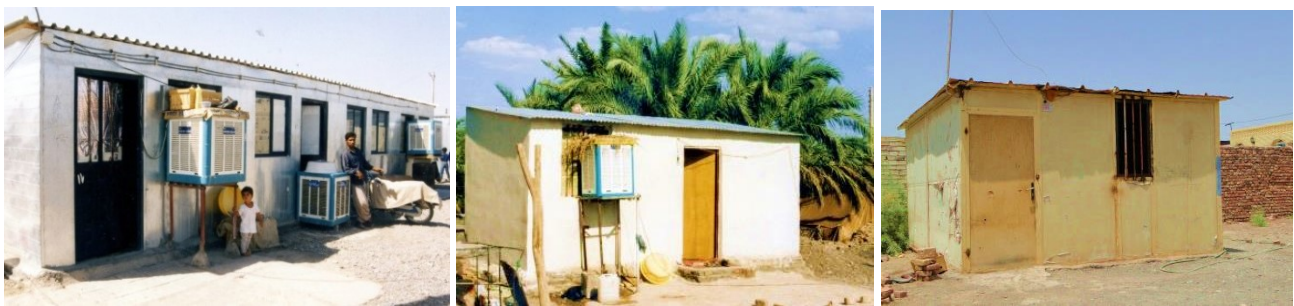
Camps of prefabricated units (left); units made of steel frames and masonry walls (center); prefabricated units in the yards of destroyed houses (right) - Photos by: M. Fayazi
